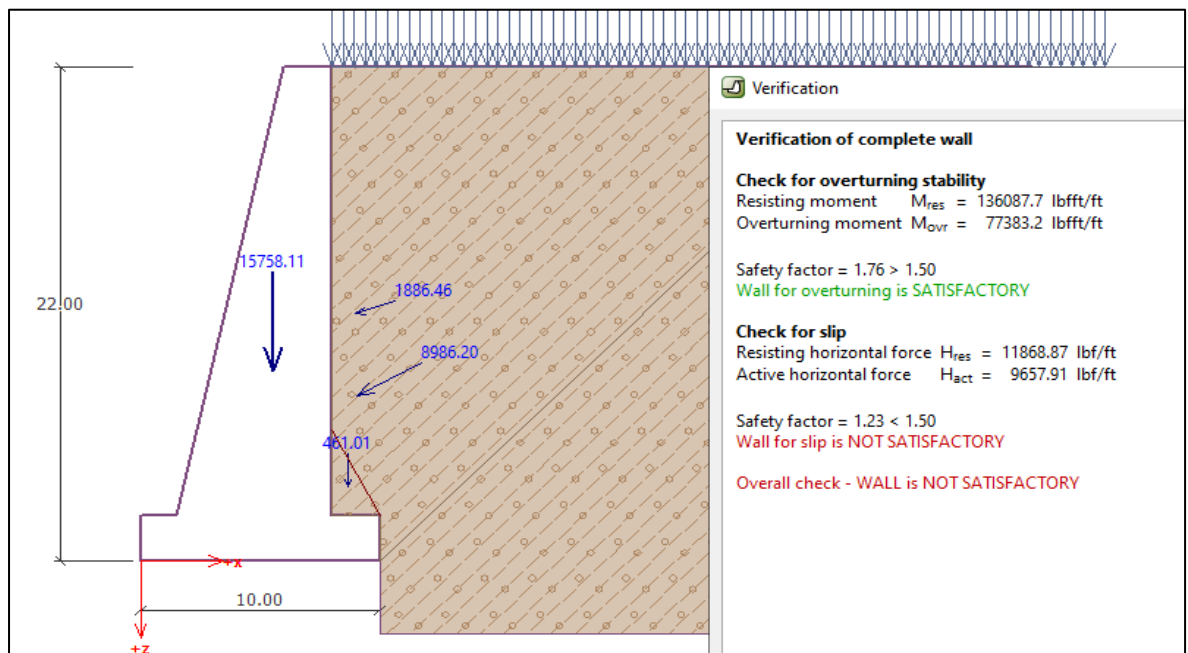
X-section view of Gravity Retaining wall from GEO-5
